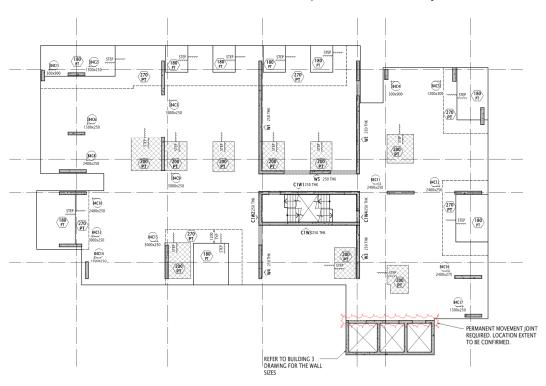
Level 1 Slab Plan (Level 2 to 8 similar)
